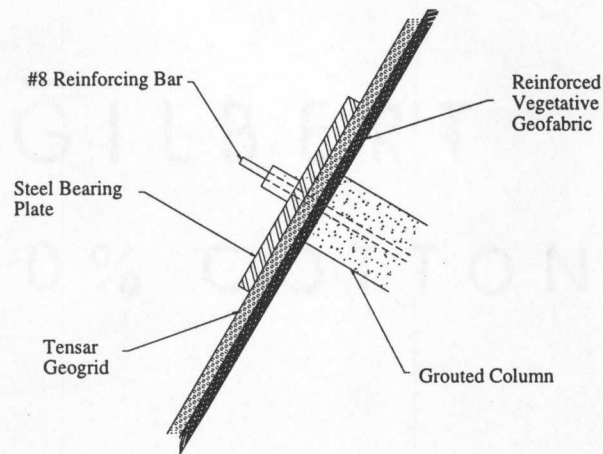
Cross Section of Soil Nailed Slope Facing
